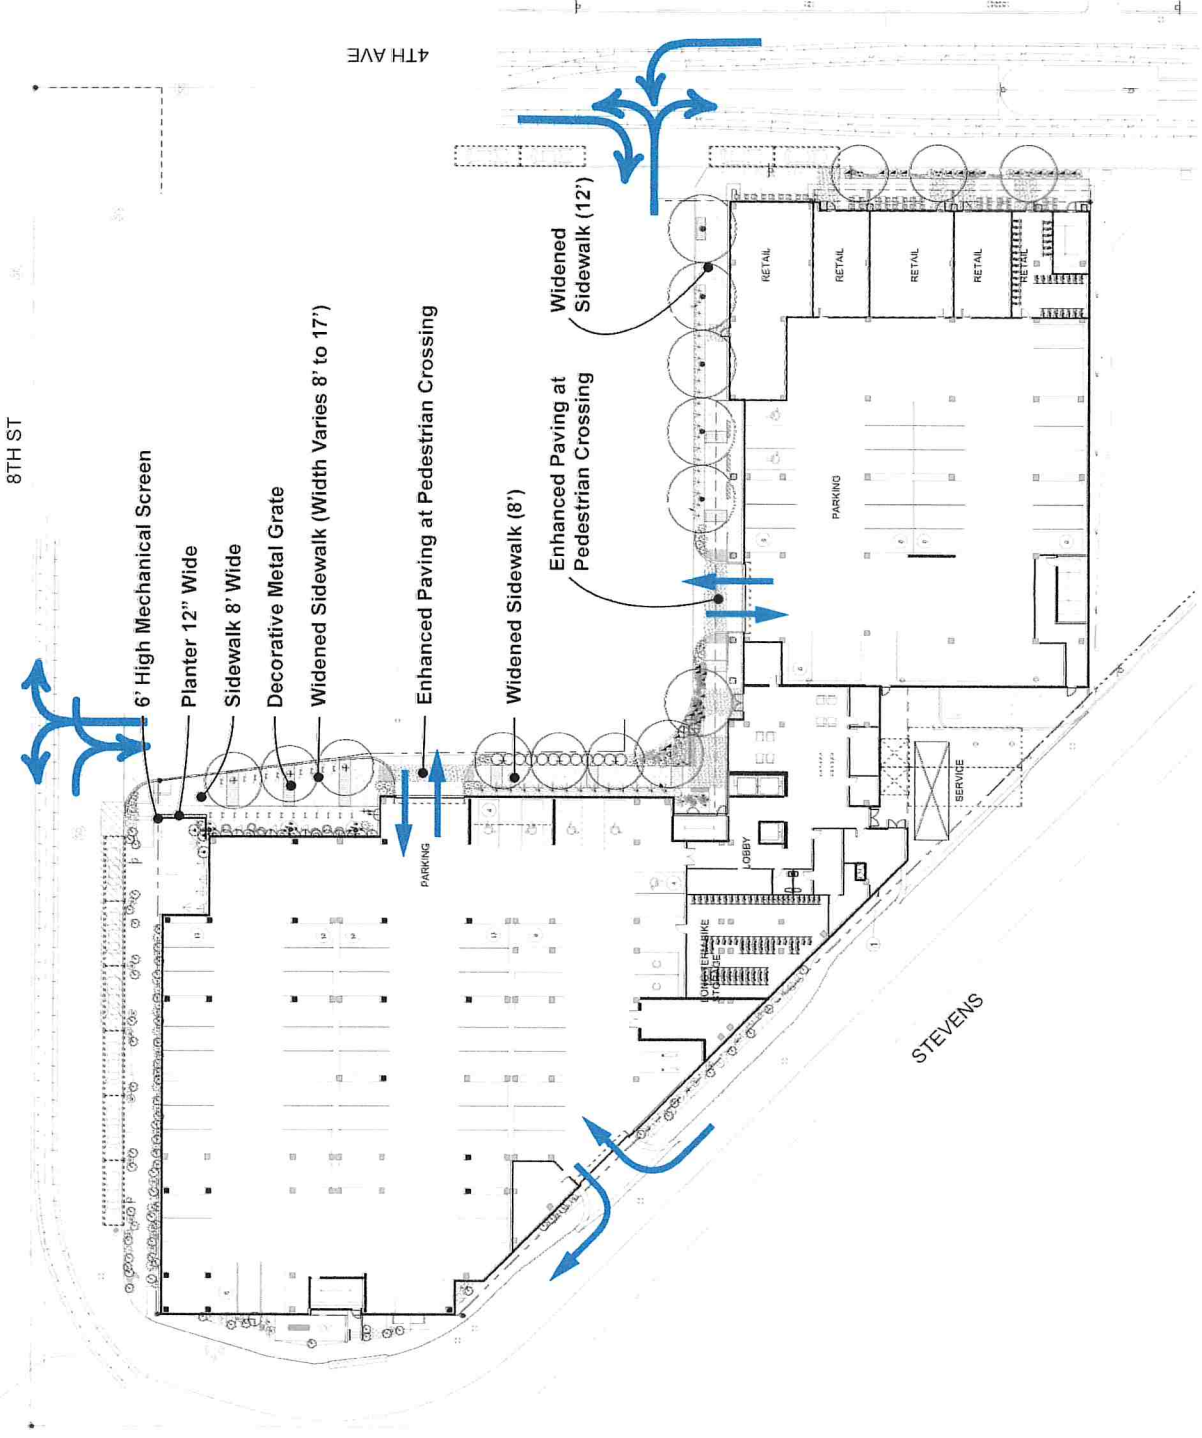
PAD NEW CONCEPT CIRCULATION PLAN
